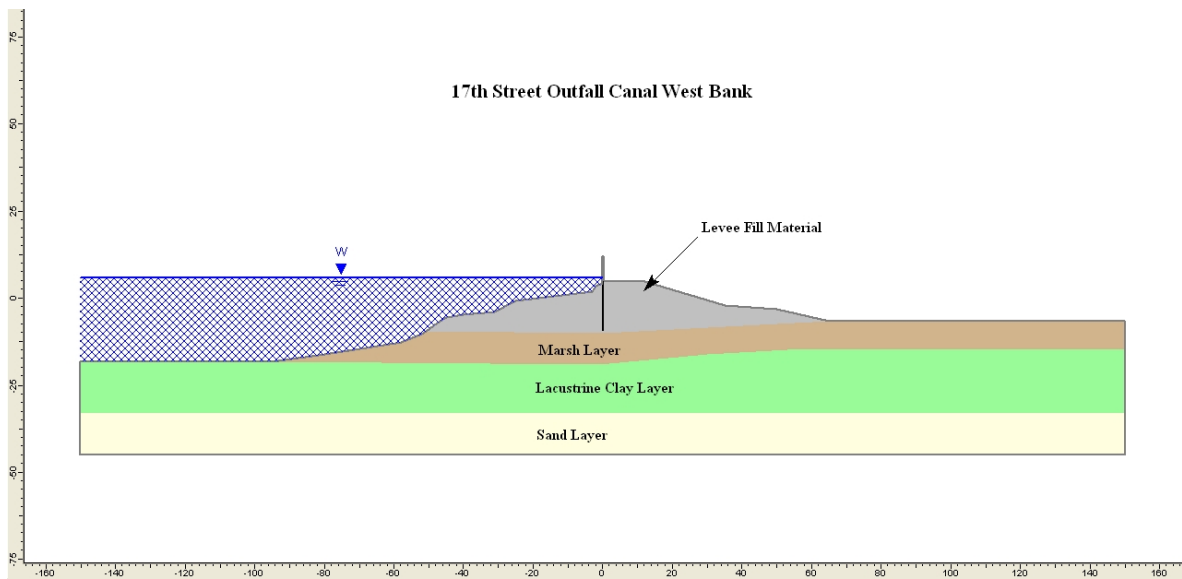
Profile of section of interest at 17<sup>th</sup> Street Outfall Canal West Bank
